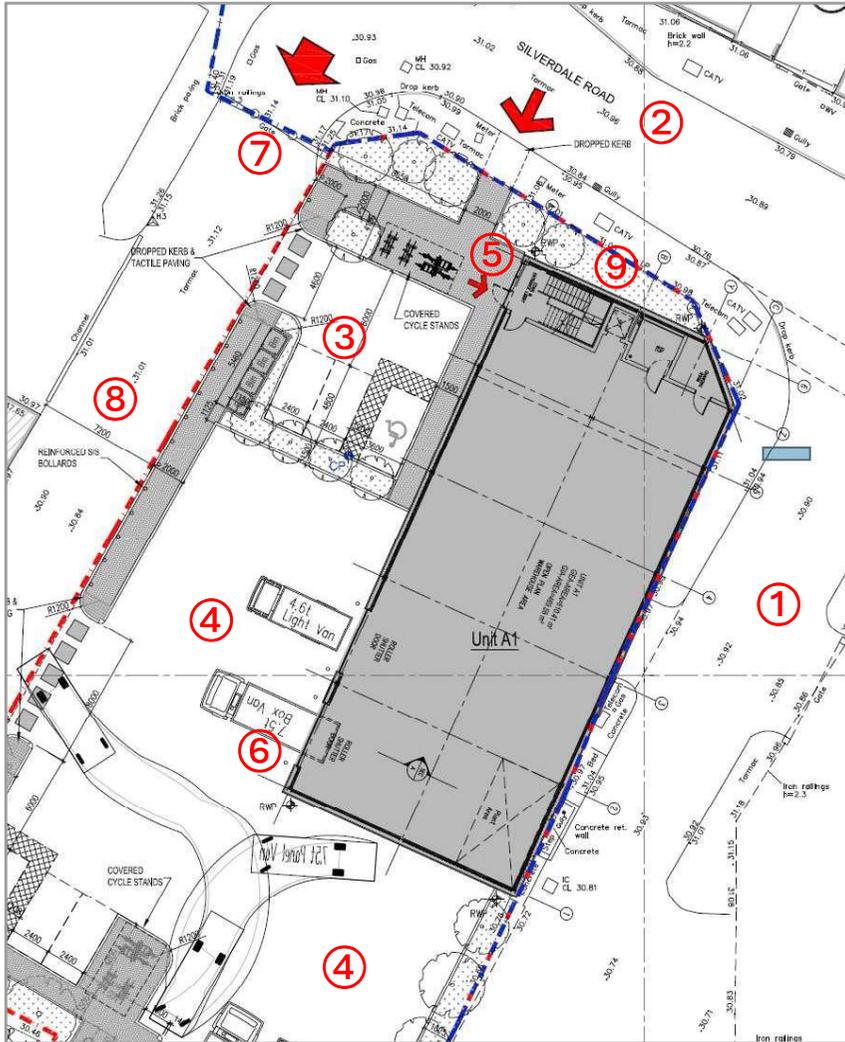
B Site Layout (extract from Drg. No. 122016 P1002 P03)
